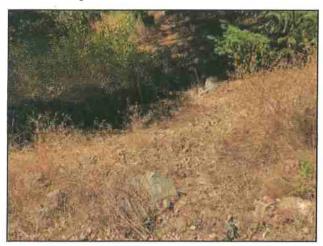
Private Access Rd Looking @ 12" Culvert Out
